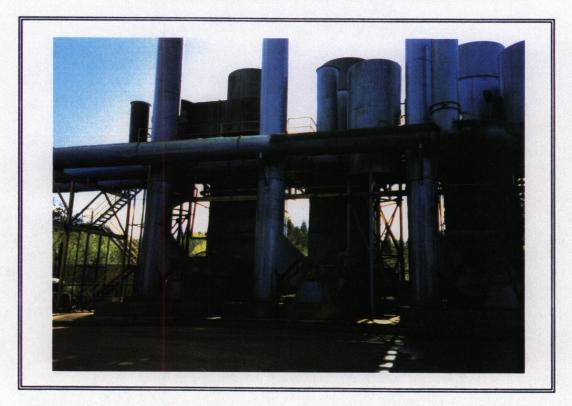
Lower portion or air emission stacks with newly installed E-Tube system (facing east).
